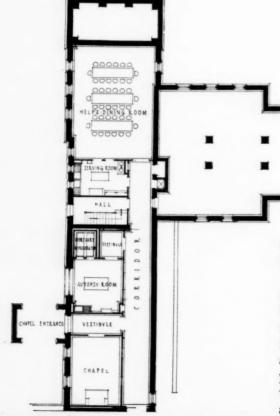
Samaritan Hospital—Female and children's wards and laboratory building. Basement floor plan.
